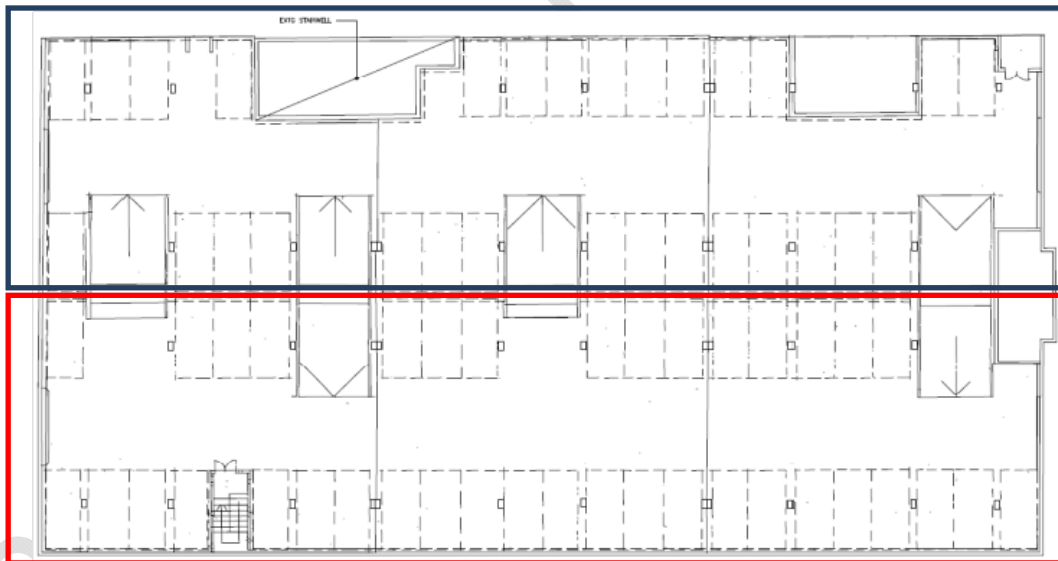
floor plan of the KK/QAT car park top level, marked in red border on the bottom half of the floor plan. The blue box contains the part allocated for the Kelsey Kerridge leisure centre extension
